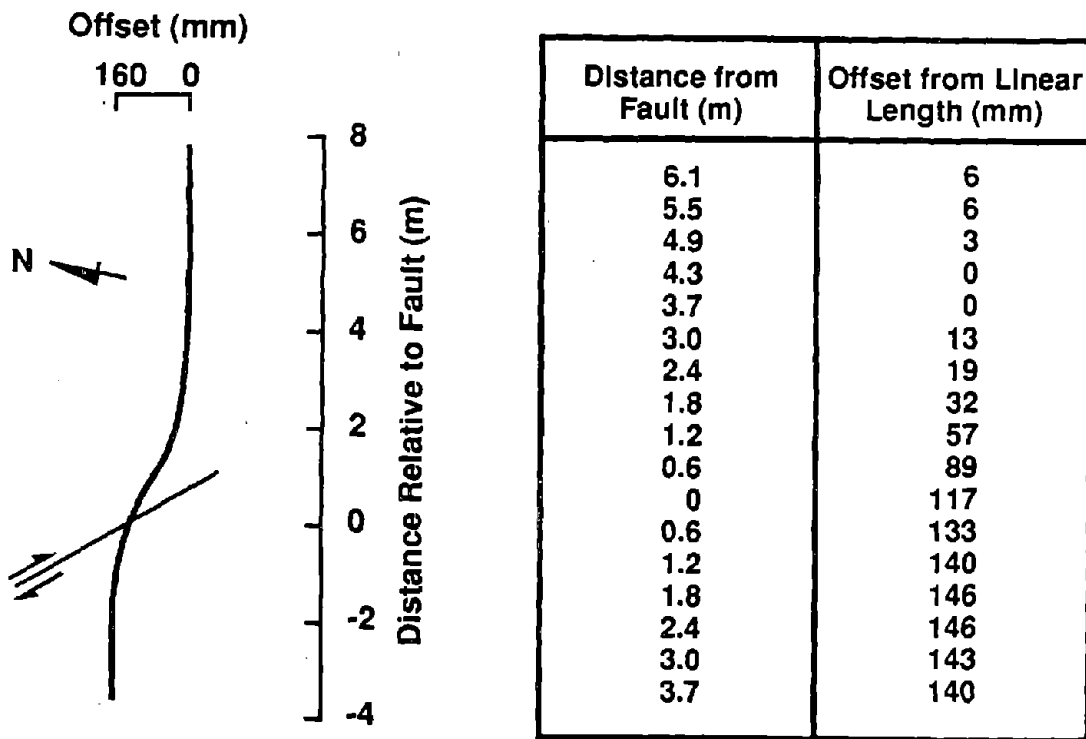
Deformed Shape of 114 mm Natural Gas Pipeline Along Highway S-80 after Excavating 9.8 m Long Trench
